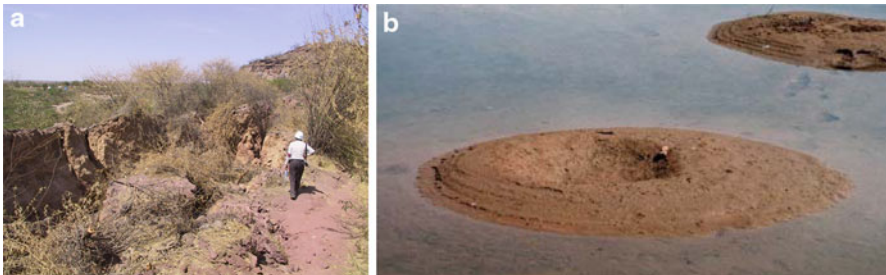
Sliding of earth dam and sand volcanos at the foot (2001 Gujarat-Kachchh earthquake, India, at Changi dam). (a) Sliding and subsidence of the dam crest. (b) Sand volcanos at the foot of upstream slope
